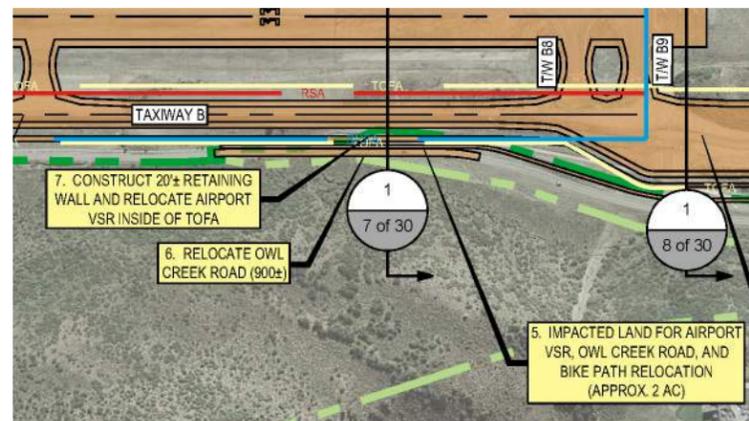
Owl Creek Road Relocation (Alternative 8a, Sheet 1 of 29)
